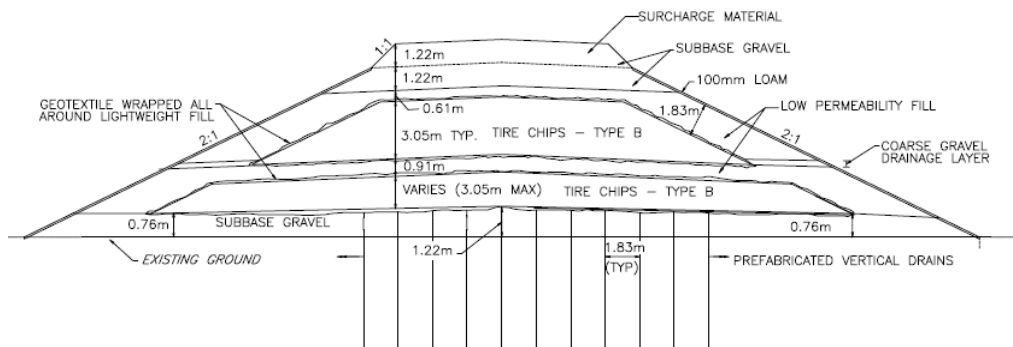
Cross section through embankment for the Portland Jetport Interchange - Humphrey et al., 1998
